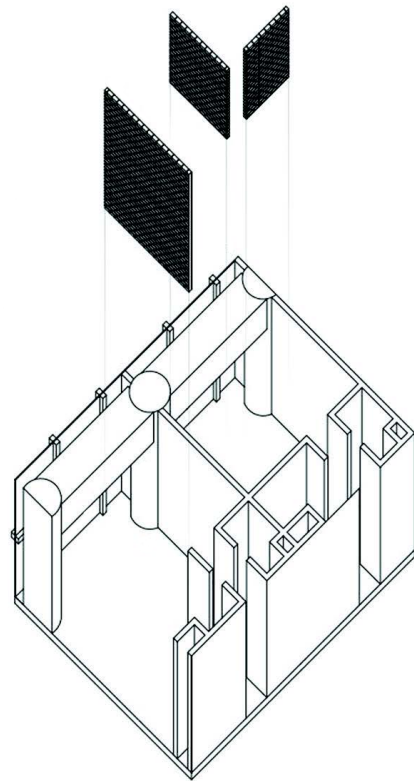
AXONOMETRIC DRAWING OF UNIT IN TORRE DAVID WITH ADDED BRICK WALLS CONSTRUCTED BY RESIDENTS. DRAWN BY AUTHOR, 2018.
